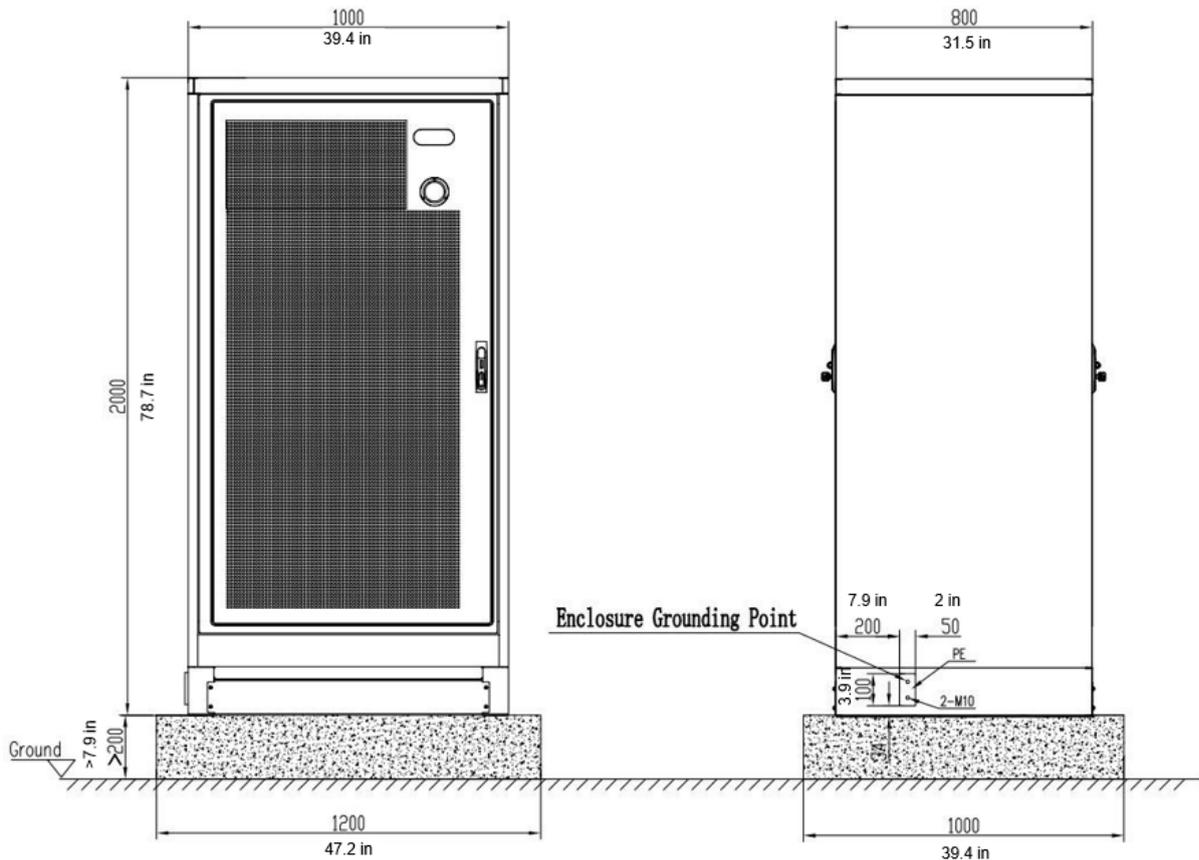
Expansion Bolt Fixing of Concrete Foundation
